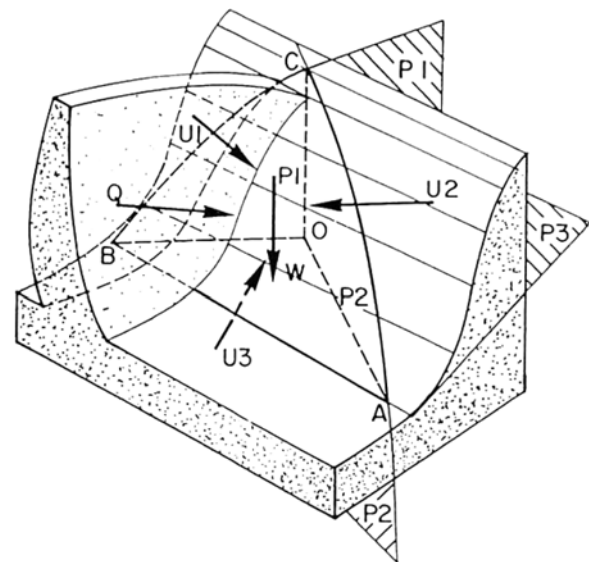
Scheme of the forces acting on a tetrahedral rock block in the abutment of an arch dam: planes P1, P2 and P3 limit block ABC; W, block weight; Q, dam thrust; U1, U2, U3, uplift pressures (after Londe 1973).
